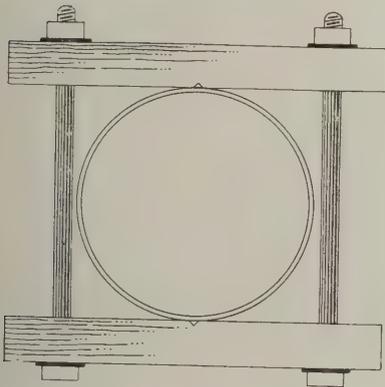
Clamp on Column to Which Braces Were Nailed—Scale 1 1/2 in. to the foot
